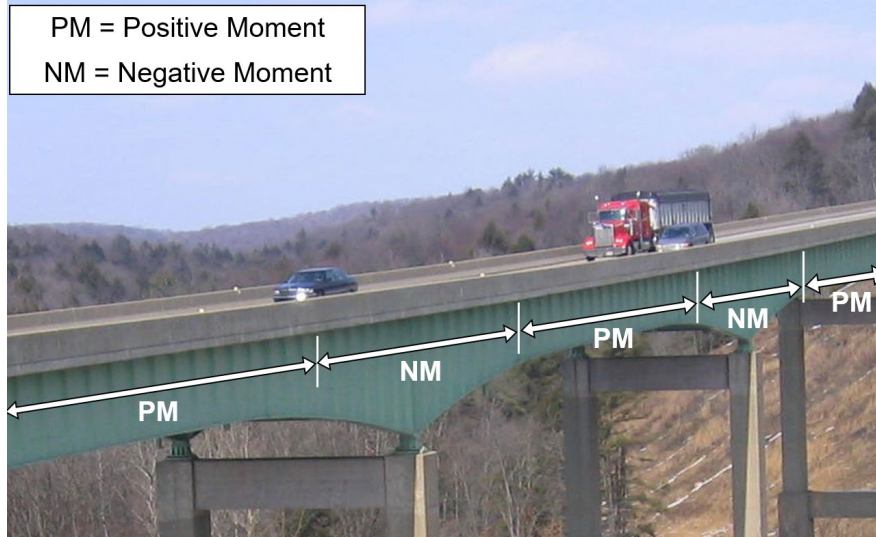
Flexural Zones on a Continuous Span Plate Girder Bridge
